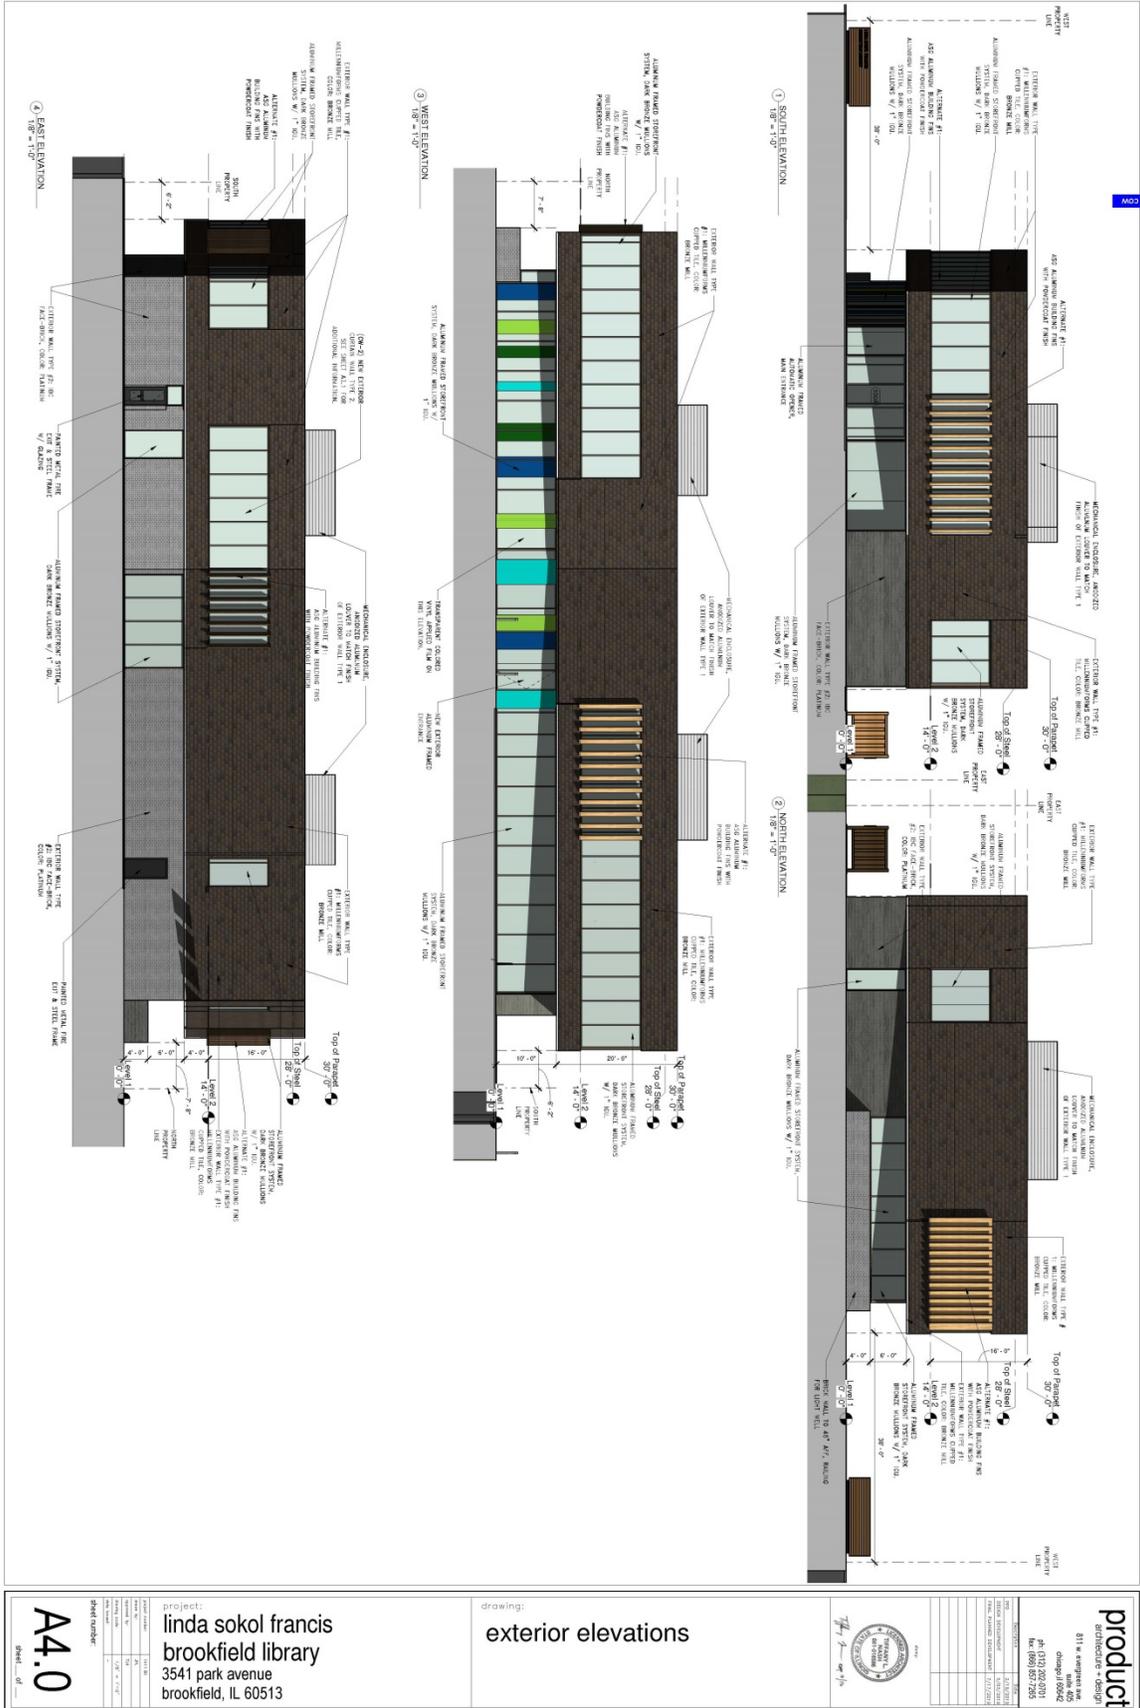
EXHIBIT "D" FINAL PLAN OF DEVELOPMENT
